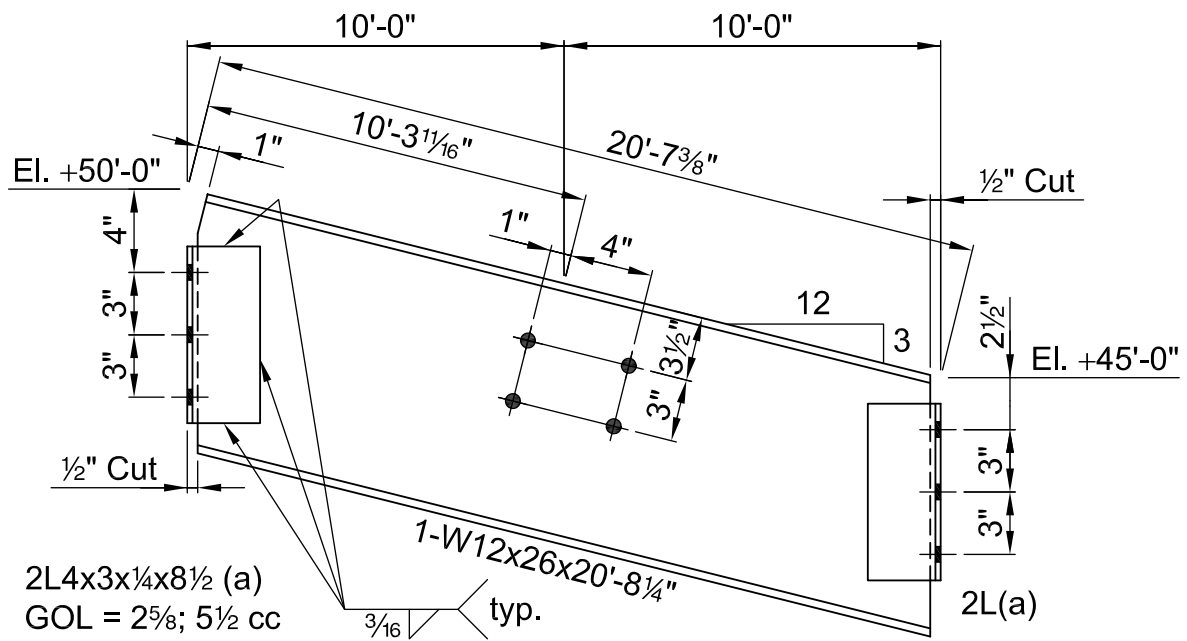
Sloped bolted/welded double-angle connection.
